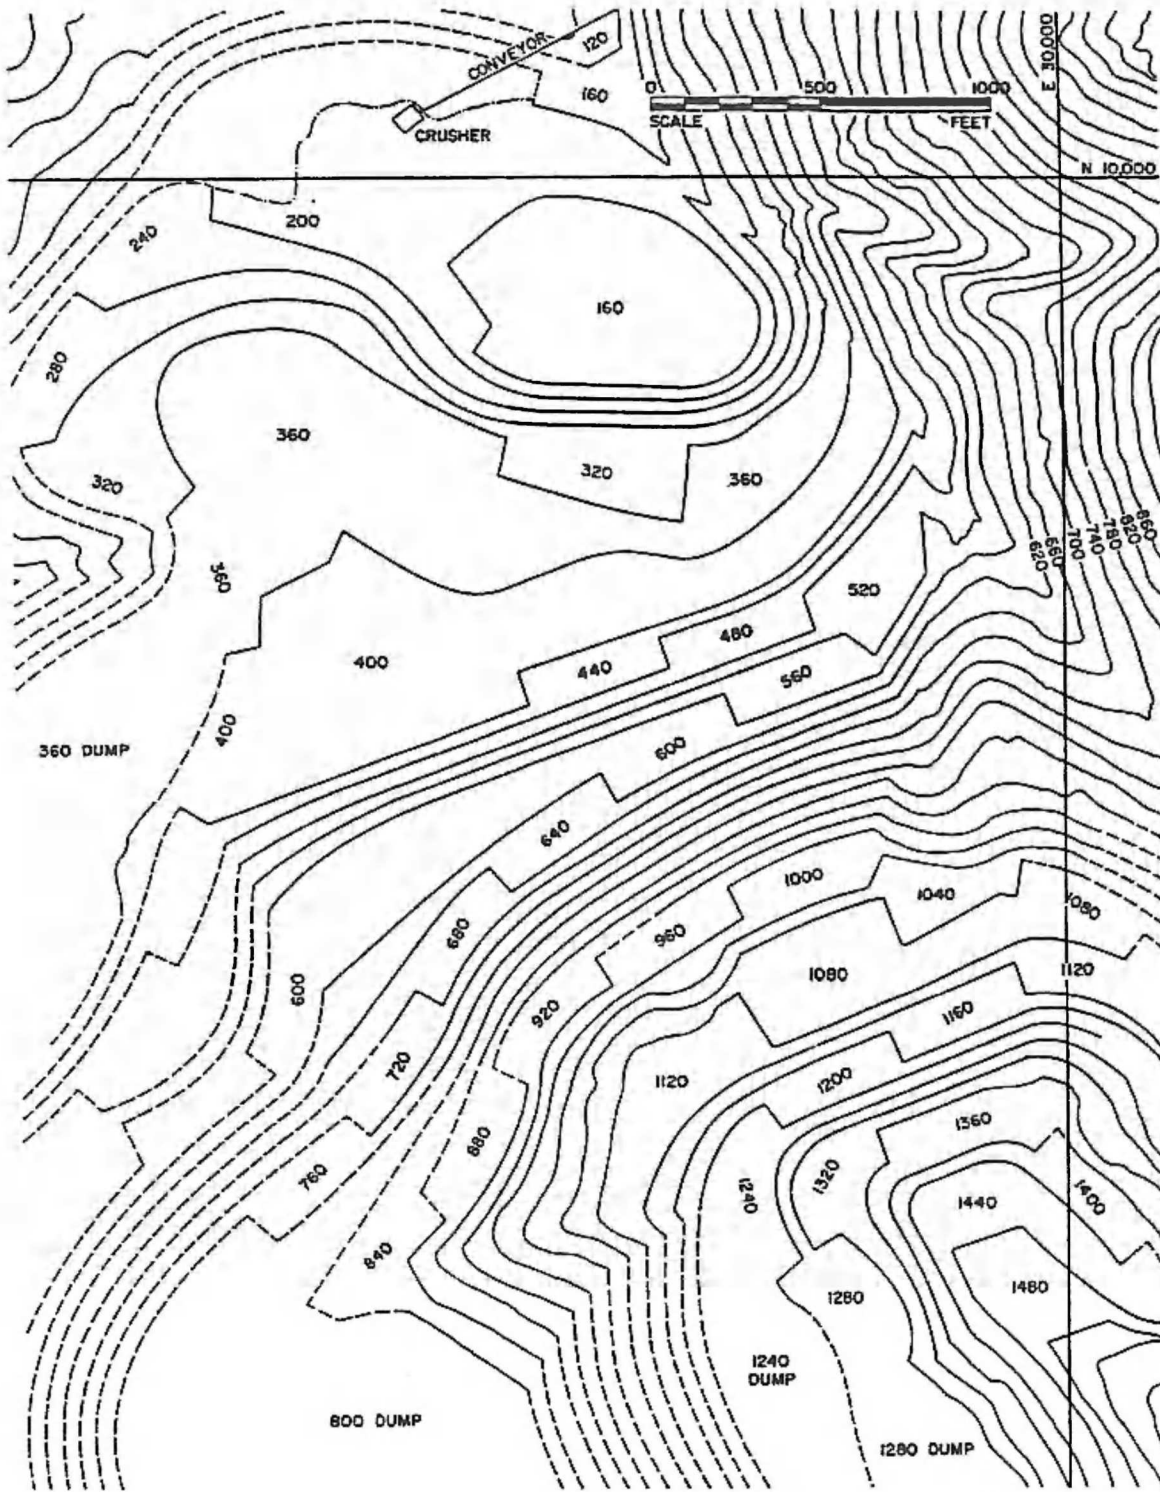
Example mining plan composite map based on midbench contours (Couzens, 1979).
